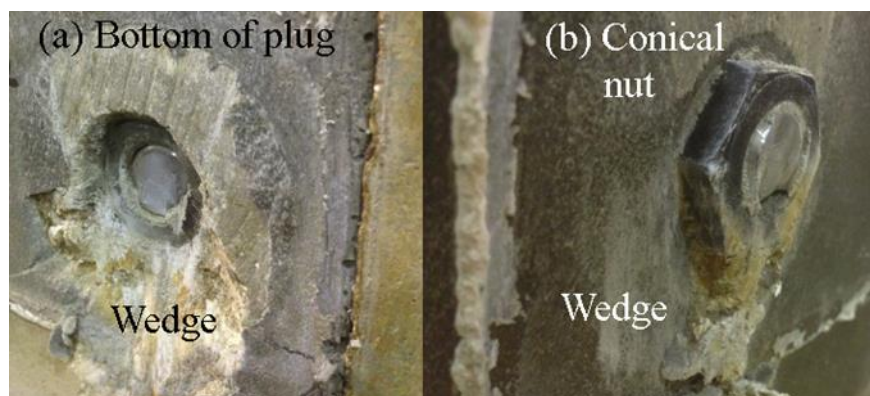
Concrete wedge failure of LNSC Test 5, (a) slab face (b) beam face
